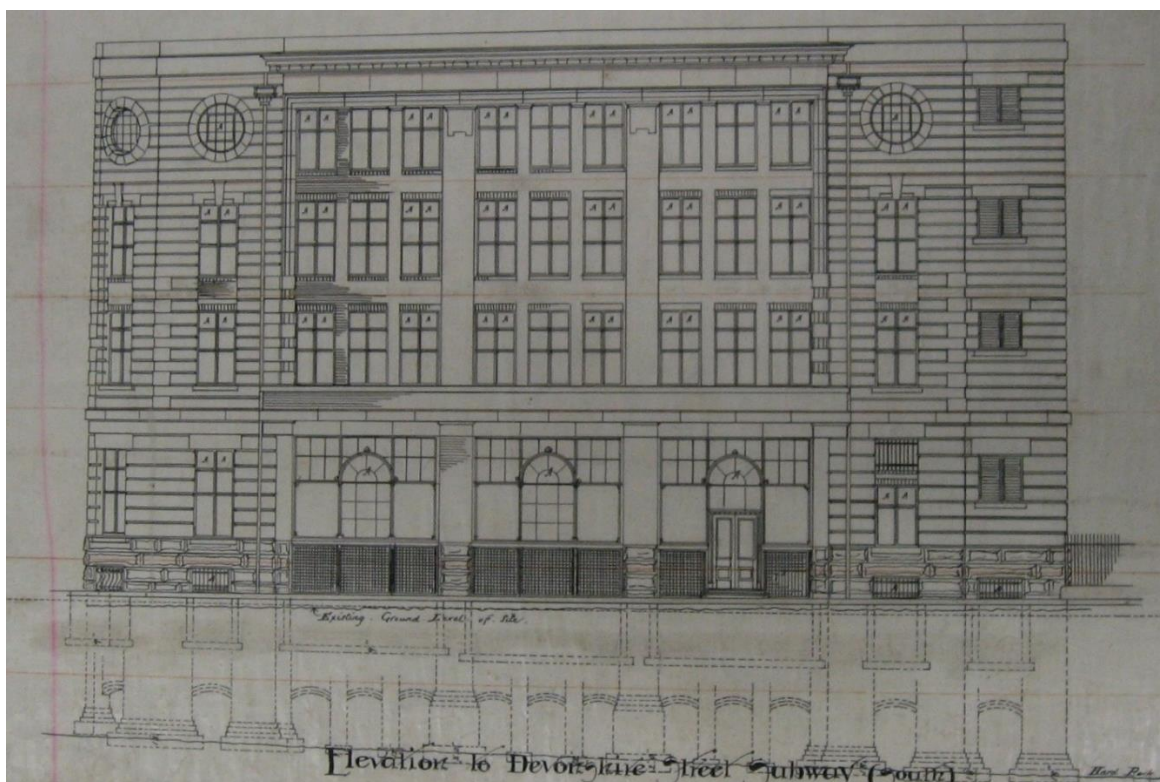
Detail from Sheet 4, Elevation to Devonshire Street Subway (south): New Parcels Post Office Premises at the Central Railway Station Sydney, signed by E L Drew and W L Vernon, 1910 (showing the original four storey elevation).
